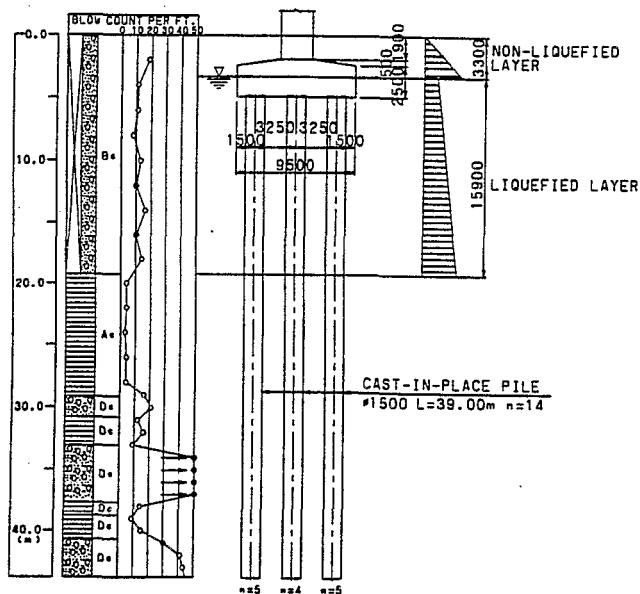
Foundation of Shin-Shukugawa Bridge in 1995 Kobe, Japan earthquake, analyzed to develop limit equilibrium method of Fig.18 (Yokoyama et al., 1997).
